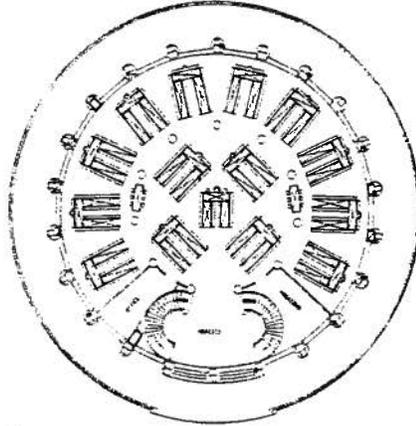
Fiat Colonia Torre Balilla, plan showing bed arrangement in the sub-basement.
